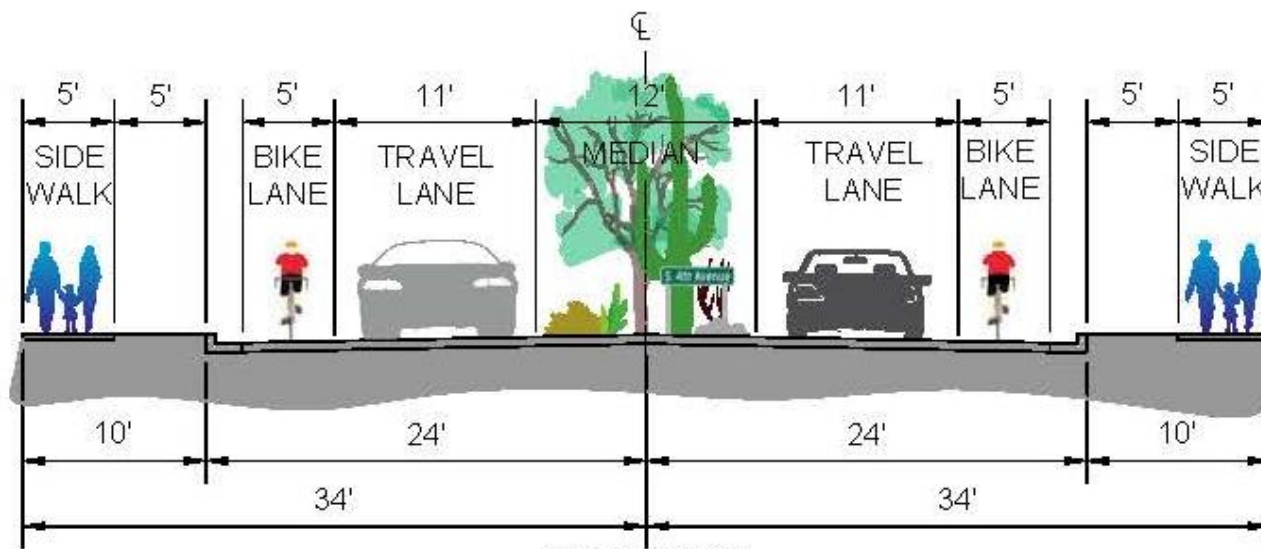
COMPLETE STREETS ALTERNATIVE ROADWAY CROSS SECTIONS
